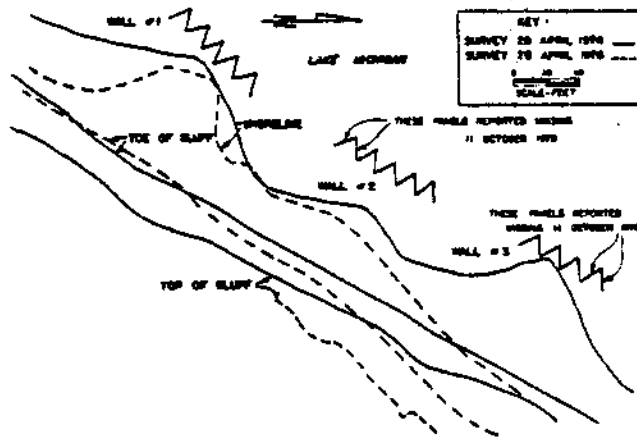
Concrete Zig-Zag Wall Breakwater, Pere Marquette Township, Michigan (Brater, et. al., 1977, p. 43)
